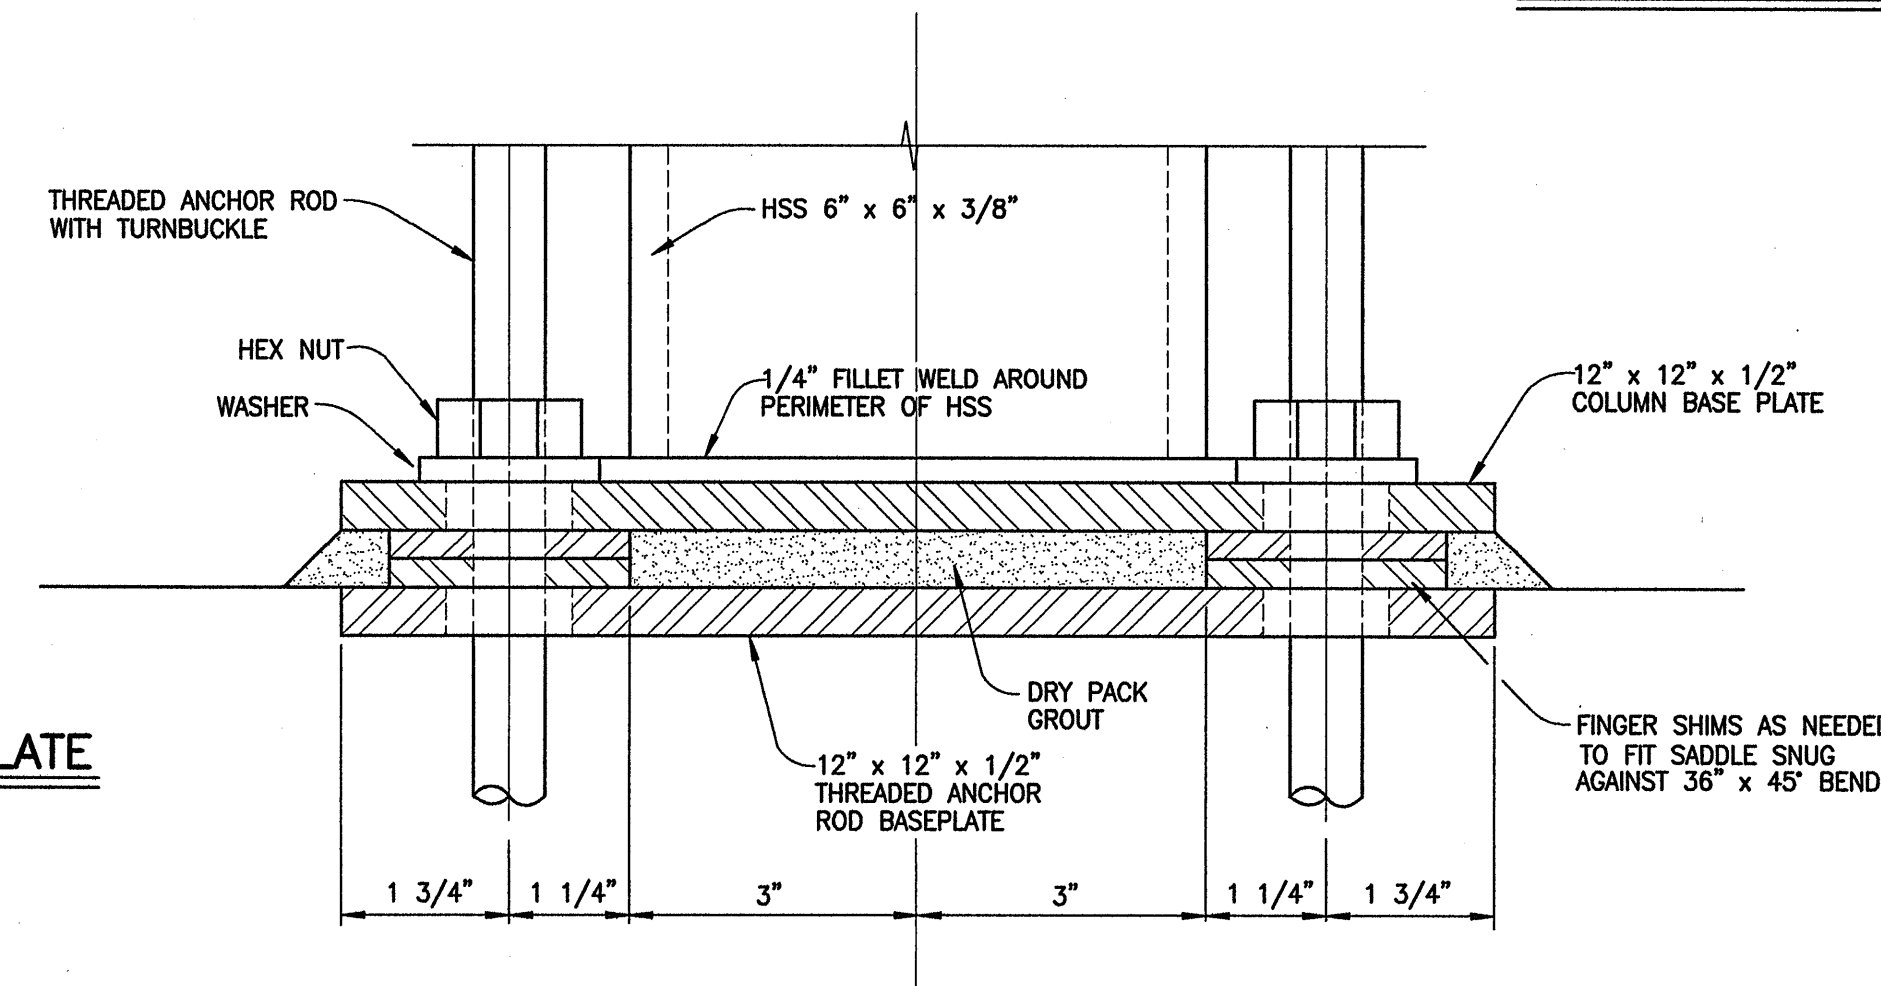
/4" THREADED ANCHOR RODS WITH
